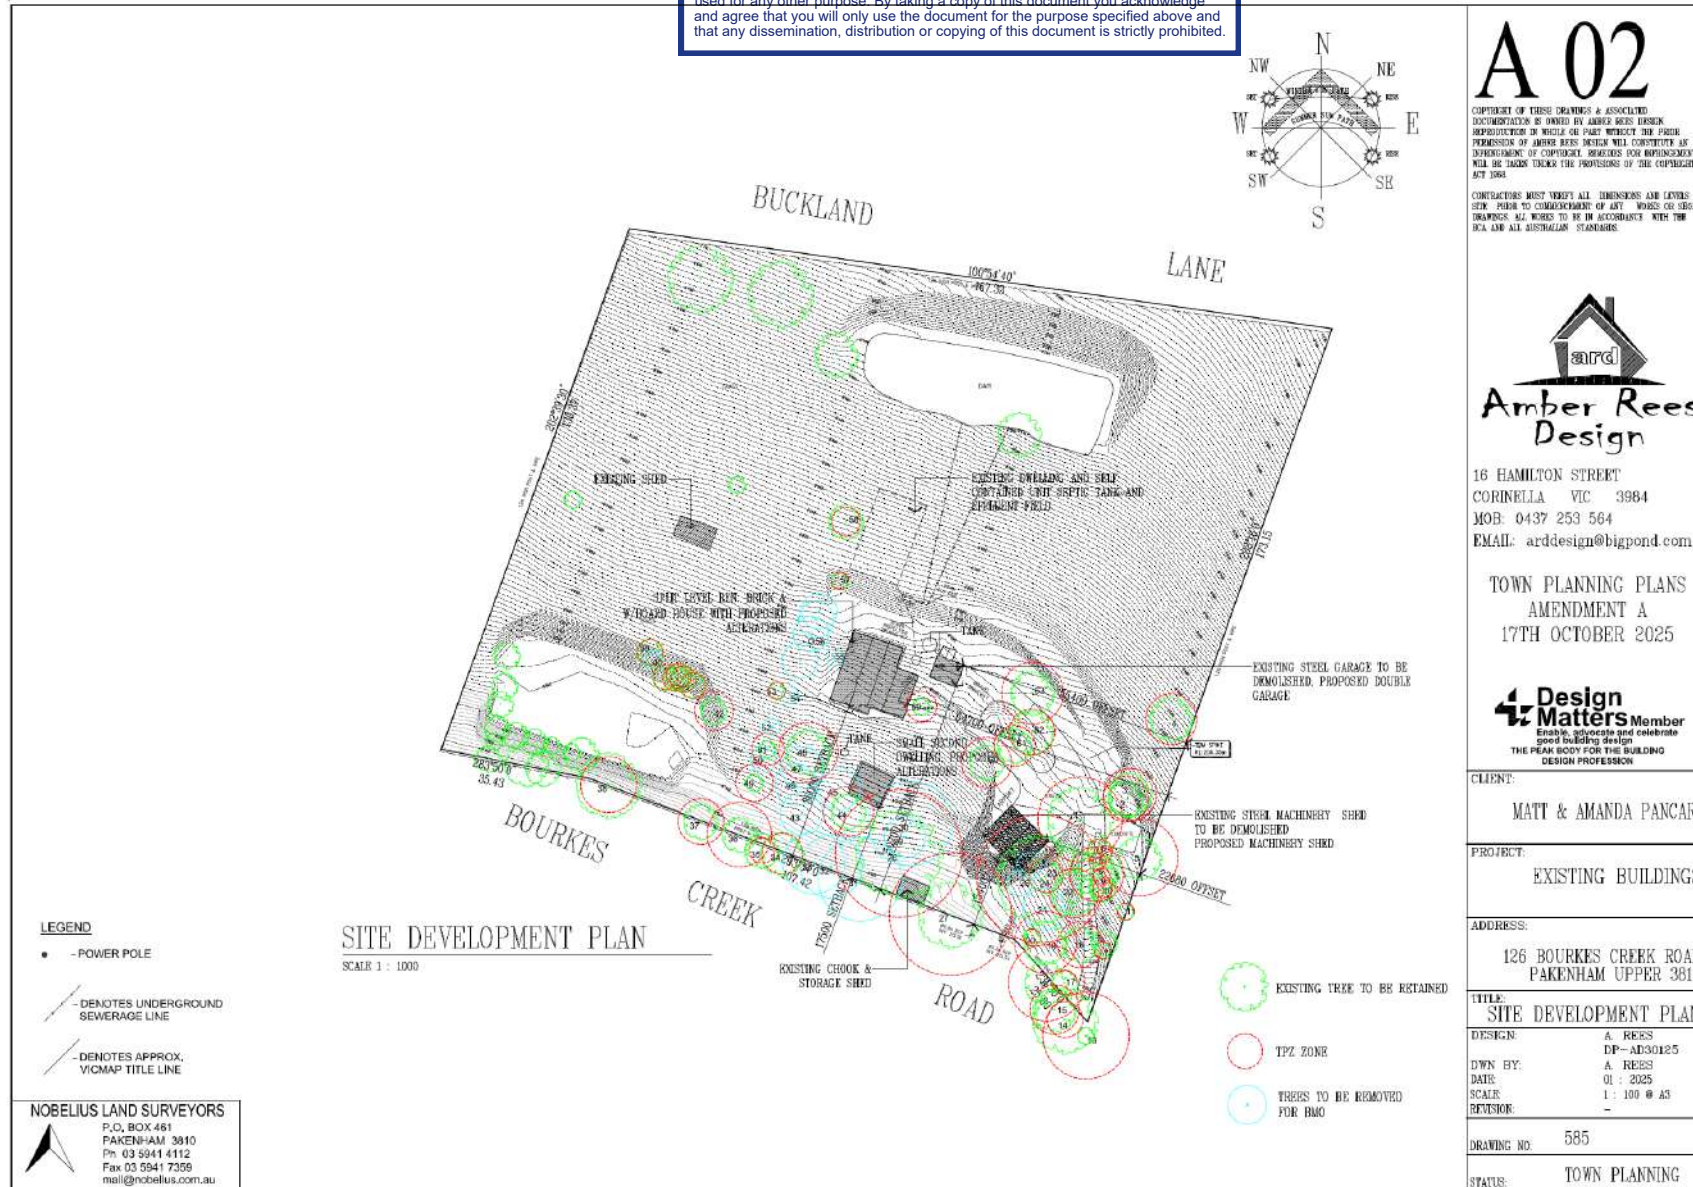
Proposed Site Development Plan showing NRZ of trees retained and trees to be removed for BMO
